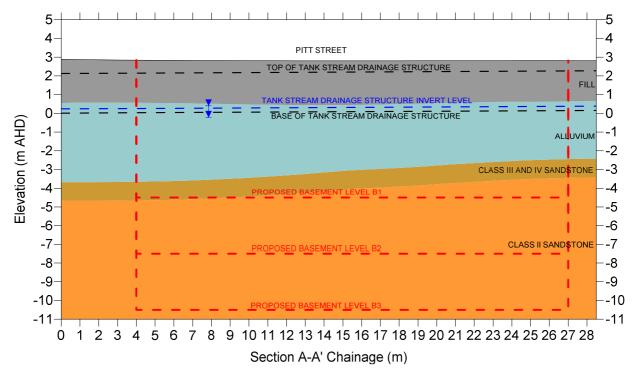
Cross Section A-A' Showing Geological Profile and Tank Stream Adjacent to the Proposed Basement Wall
